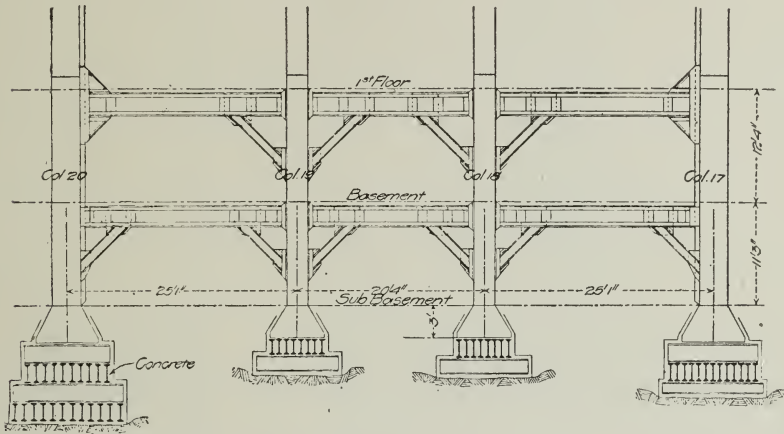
Grillage Foundations on Rock. Metropolitan Life Insurance Company's Buildings, New York.
